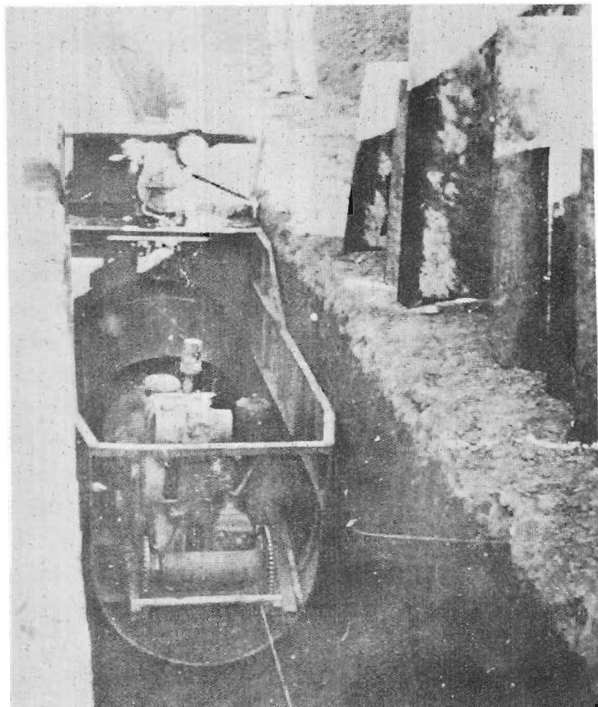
A monolithic unreinforced concrete pipe machine in operation in an excavated trench. CH-357-62.
